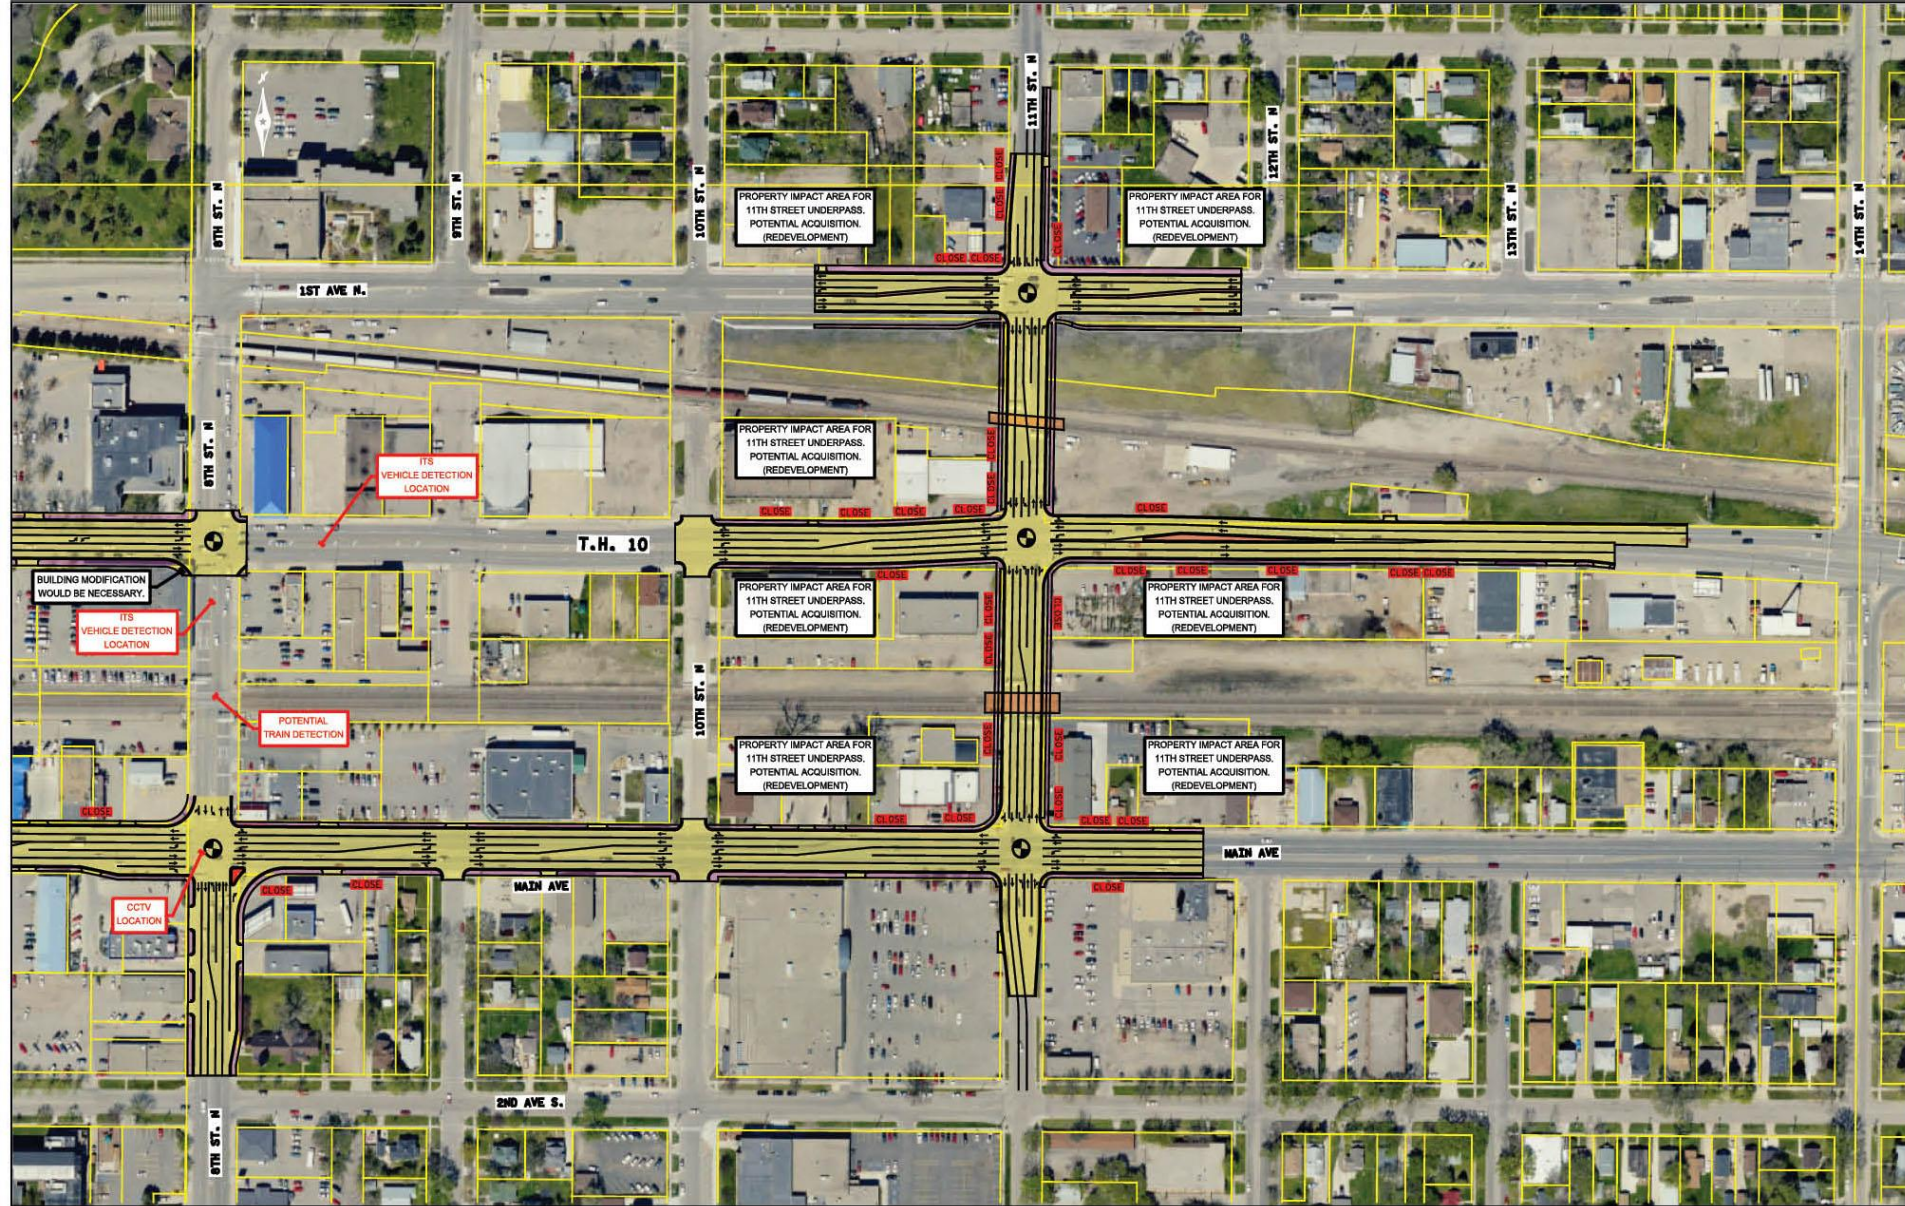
TH 10 Build Alternative C – Underpass (Segment 2)
